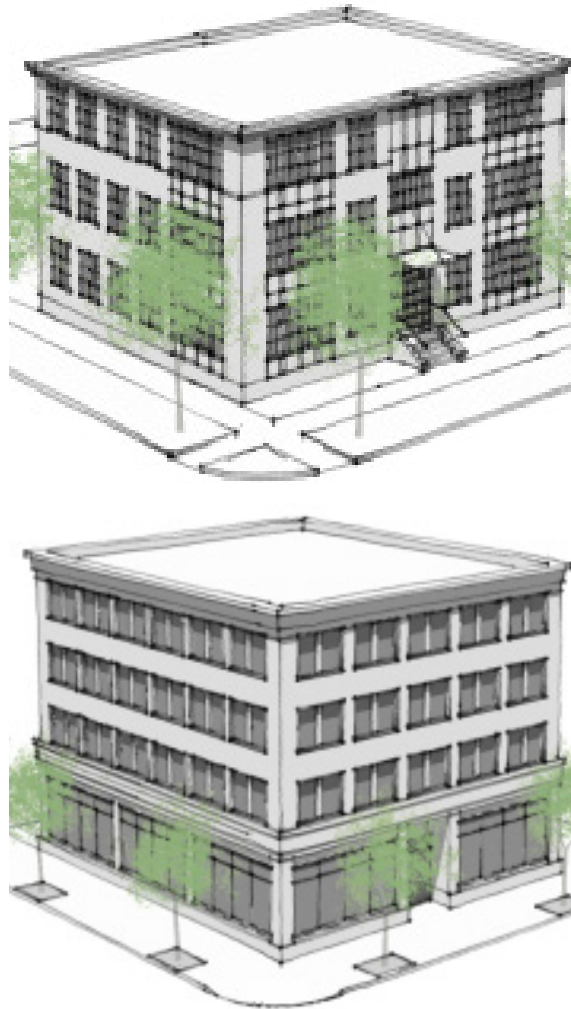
General building examples with stoop entrance (top) and storefront entrance (bottom)
